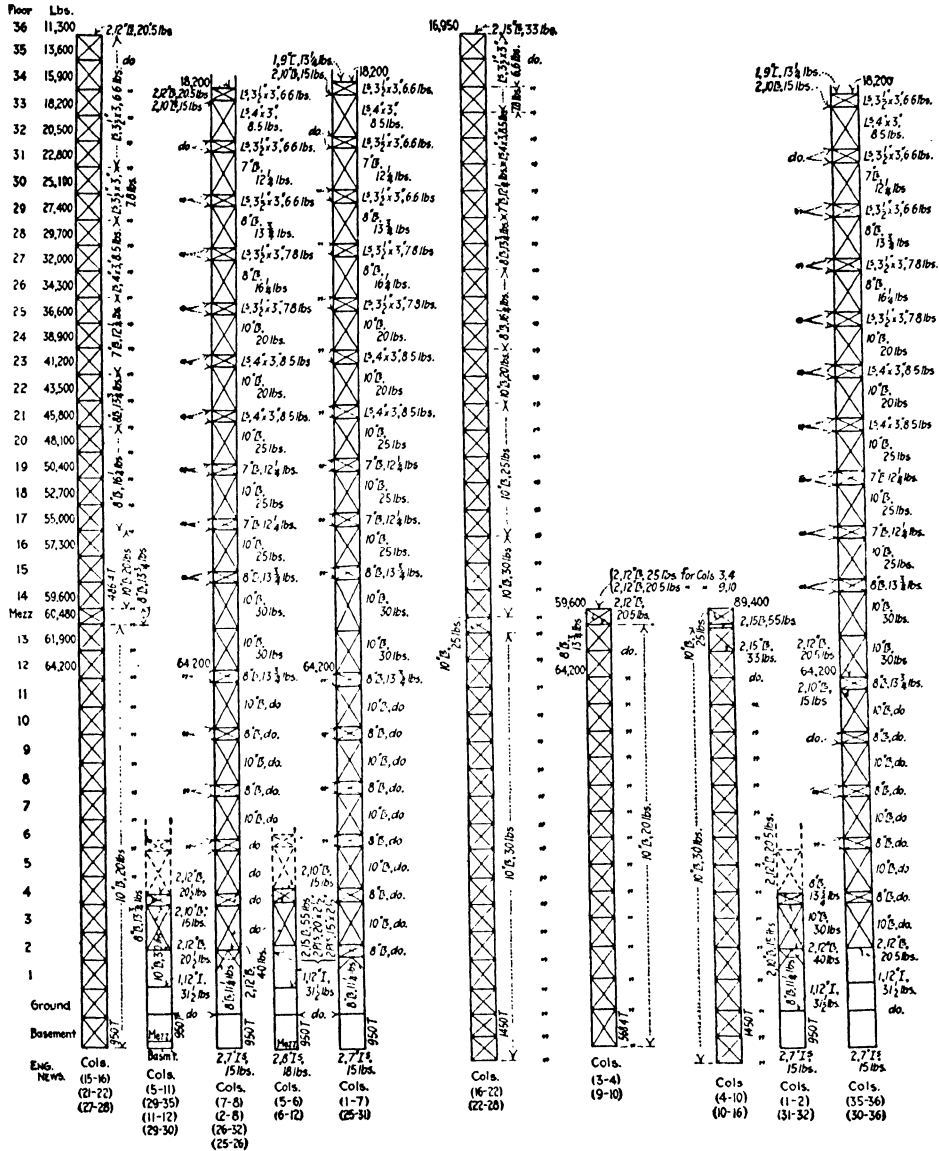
DIAGRAM OF WIND BRACING, SINGER BUILDING.
